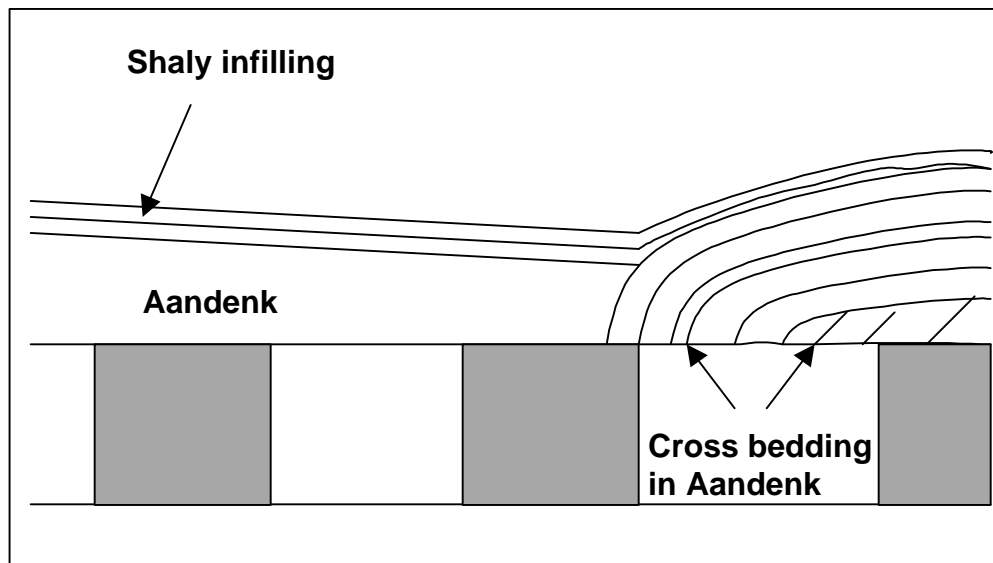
Typical hangingwall conditions in the Aandenk formations (Source: Oryx Mine, Rock Mechanics Department).
